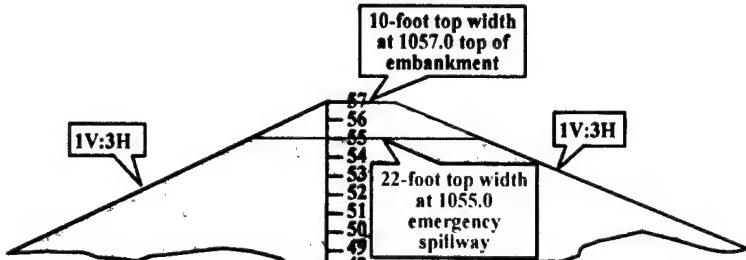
Norland embankment – 1,200-foot emergency spillway sections
